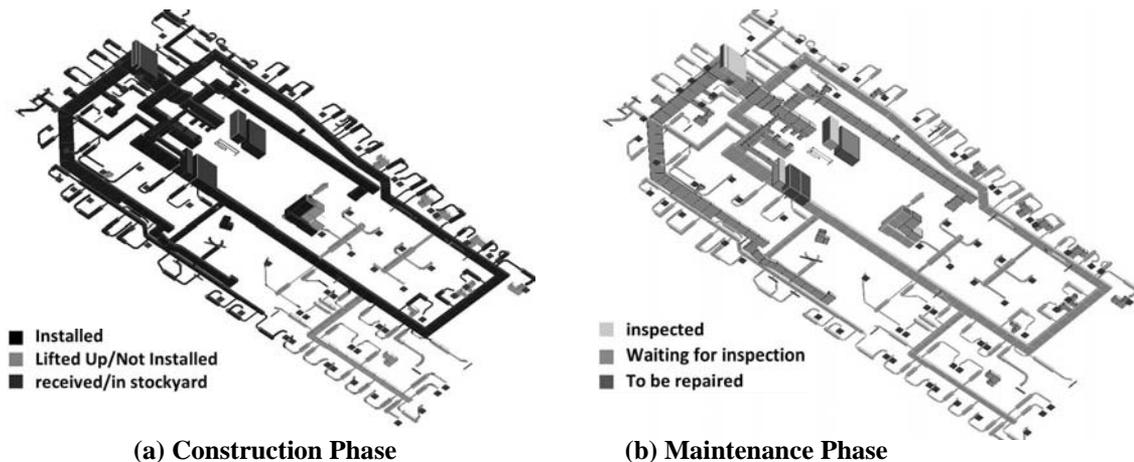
HVAC 3D drawings of one floor of the JMSB building
